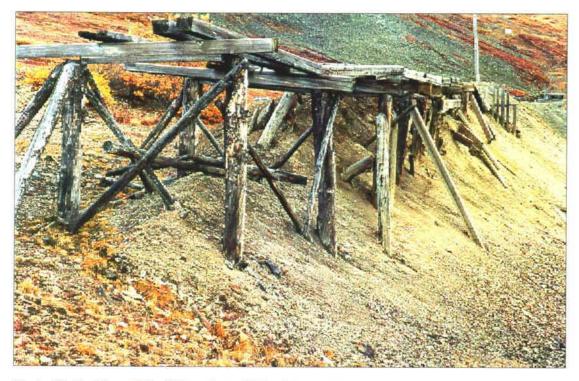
Keno 200. Old trestle to S.W. of site looking N.E.
